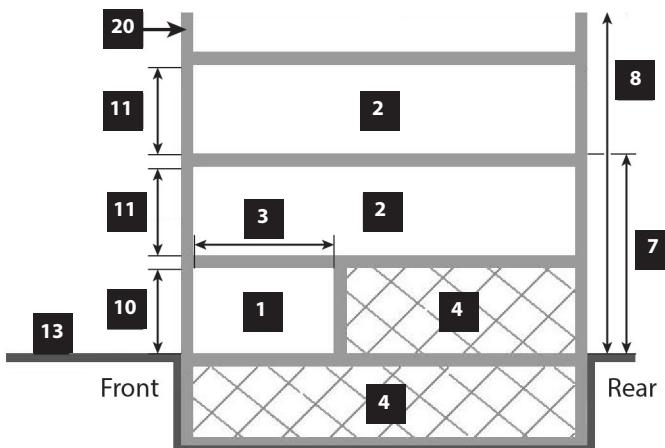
Limited bay building height and use diagram shown with basement and rear building interior parking, storefront entry type, and parapet roof type. Not to scale.
